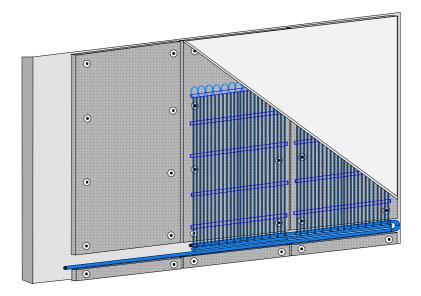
Arrangement of the collector pipes and piping according to "Tichelmann" by utilisation of insulation sheets for the formation of installation grooves.
